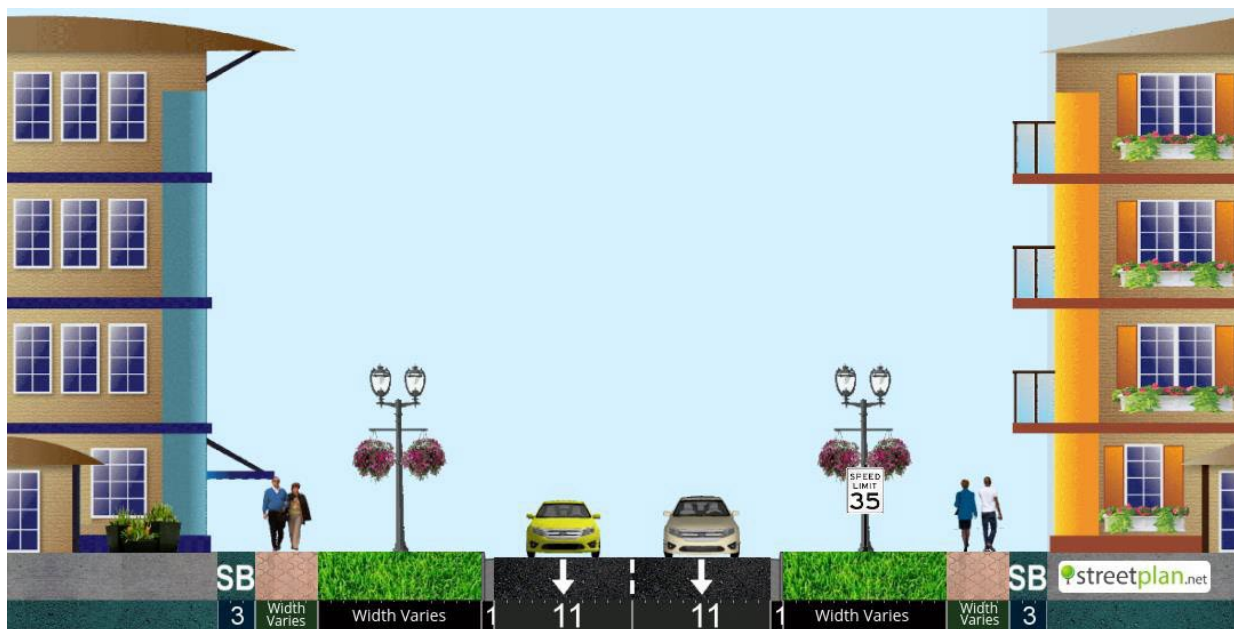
Local Street for Commercial and Industrial Cross Section
